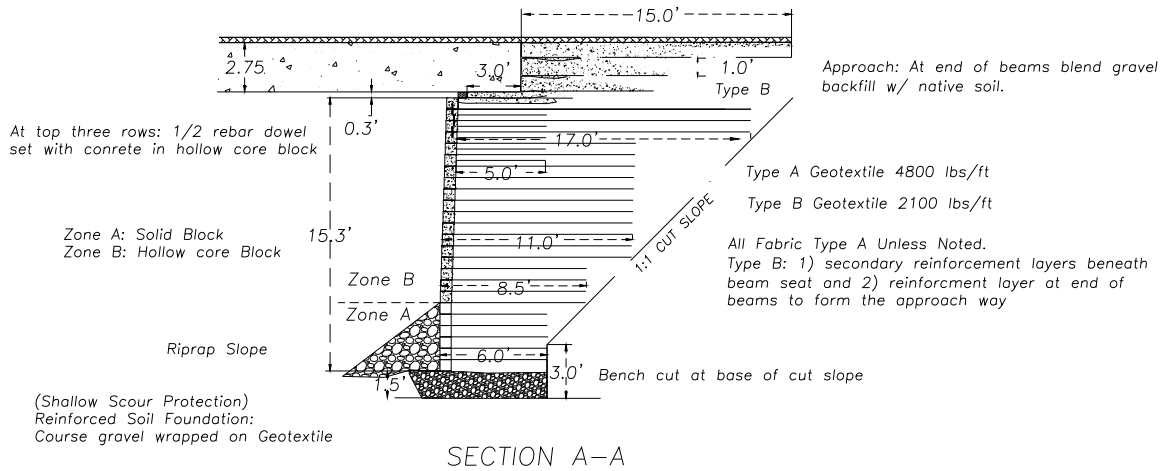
Reinforcement Schedule (Abutment and Approach Way)
